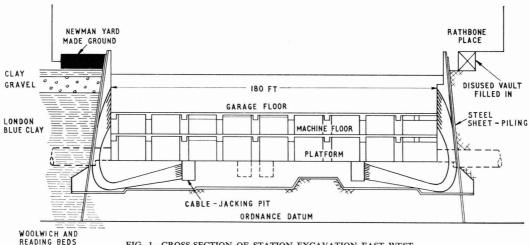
CROSS-SECTION OF STATION EXCAVATION EAST-WEST
